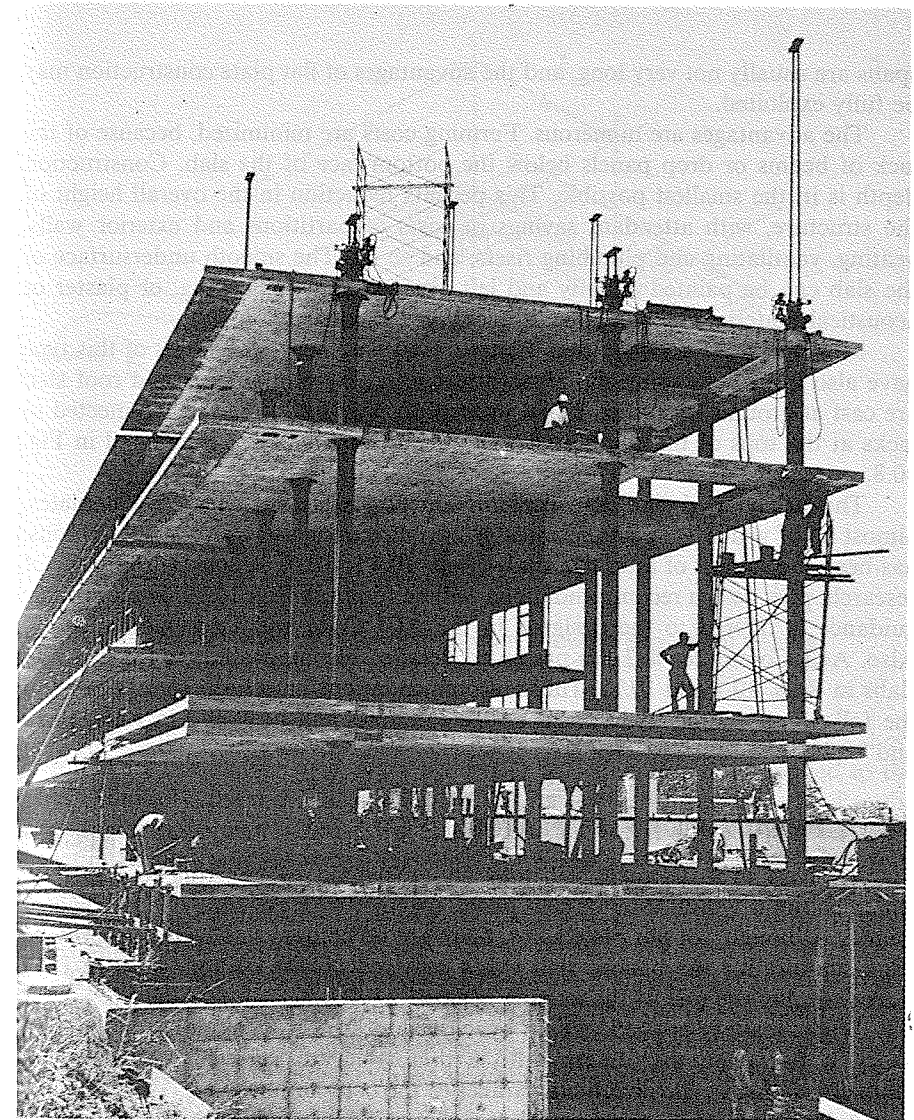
Lift-slab building under construction at Clemson College, South Carolina.
